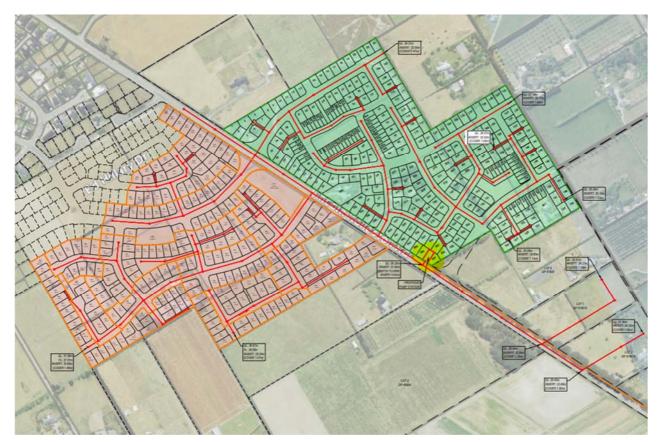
Proposed gravity reticulation and wastewater pump station (shaded yellow) (Source: Updated subdivision consent design report)
